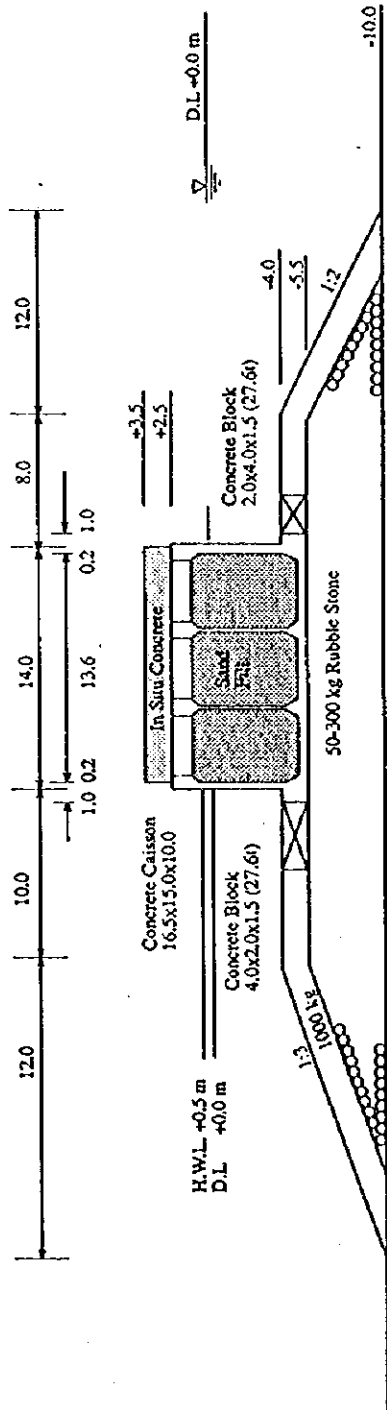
Standard Cross Section of Breakwater Caisson Type (-10.0m)
